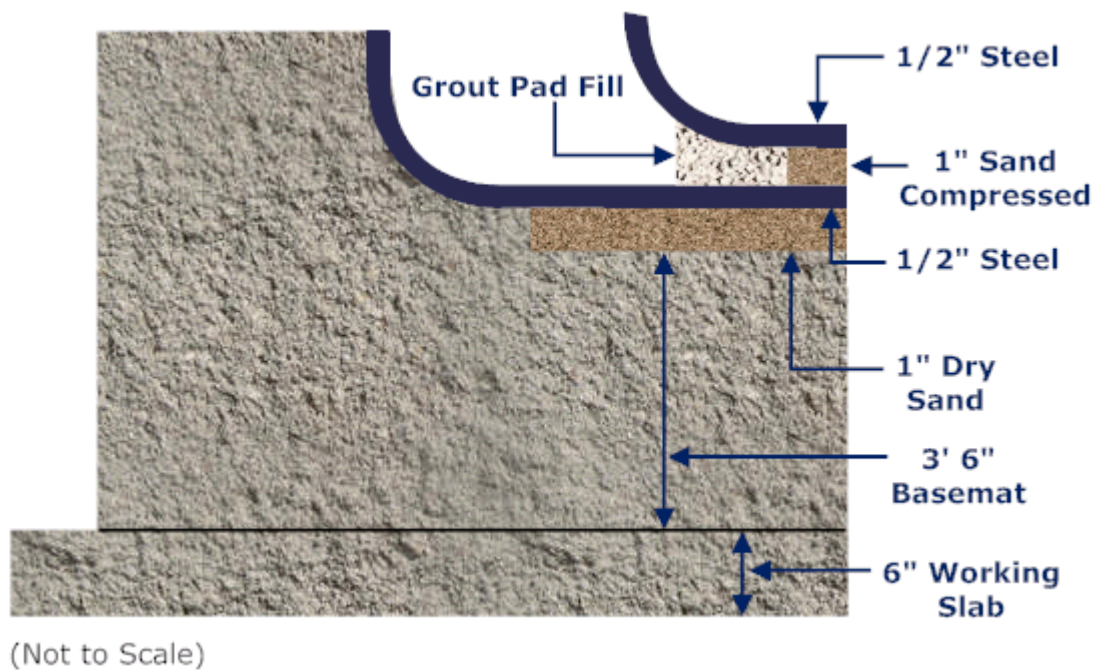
Early Stage of Type II Tank Vault Construction
